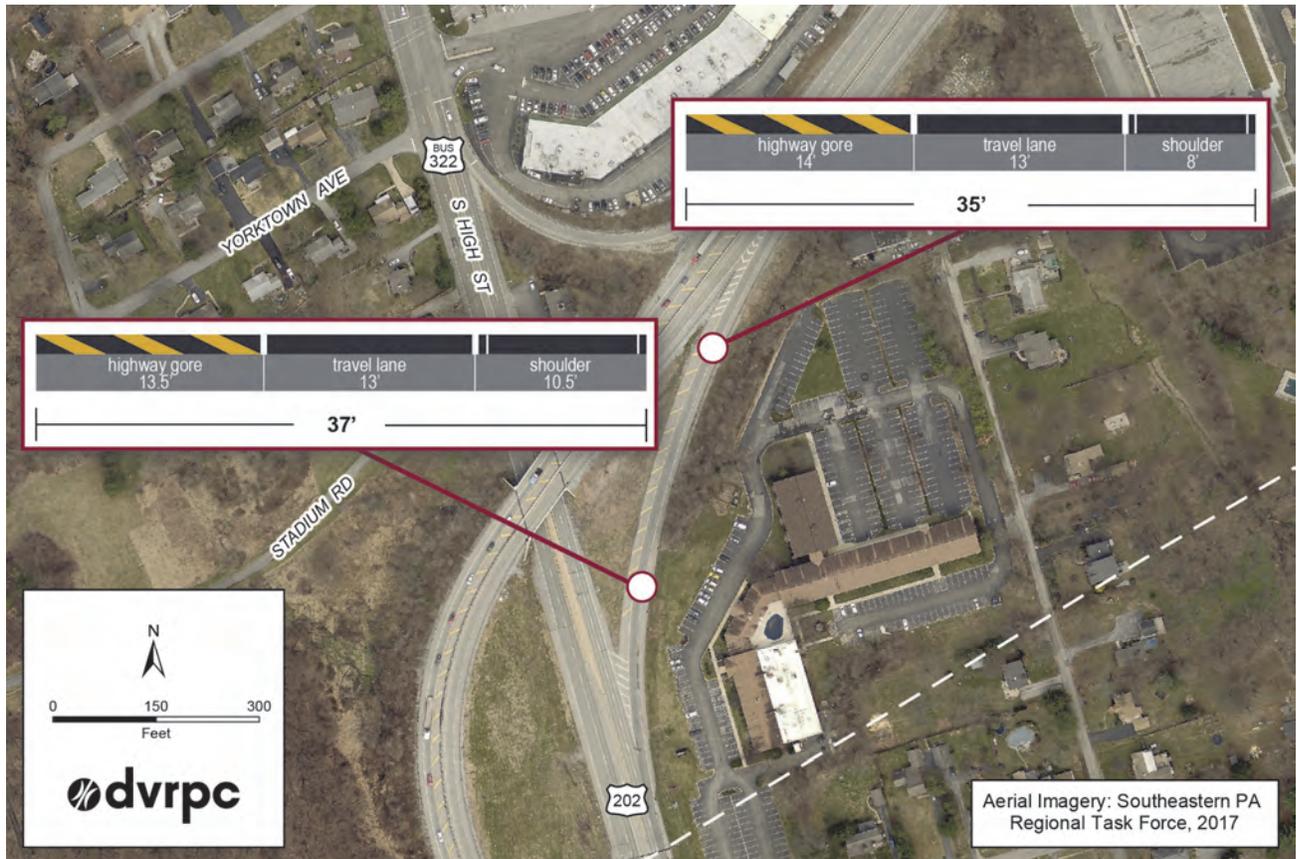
and 8 show cross sections at specific points on the US 202 ramps. Both ramps have a minimum shoulder width of 8 feet and a wide highway gore area that is the same width or wider than the travel lanes (minimum 12 feet).
